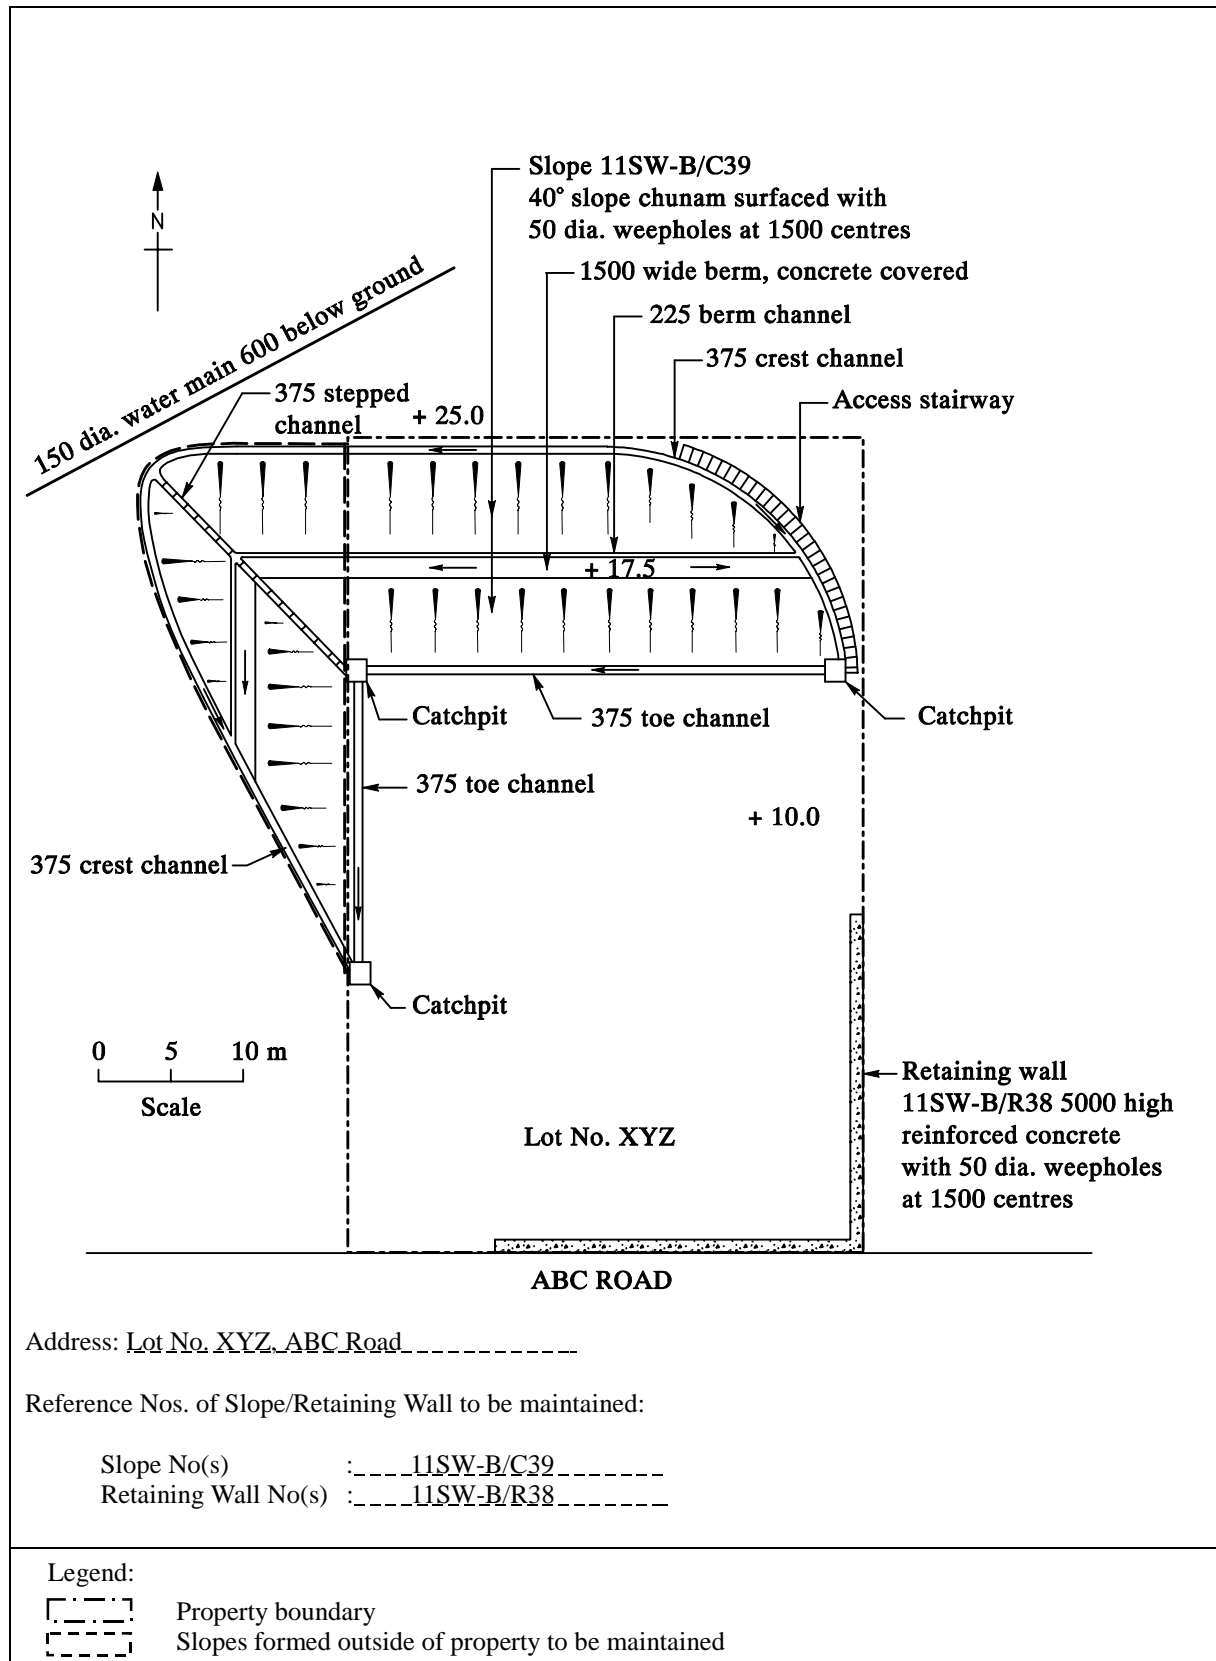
Typical Plan of Slopes/Retaining Walls to Be Maintained
